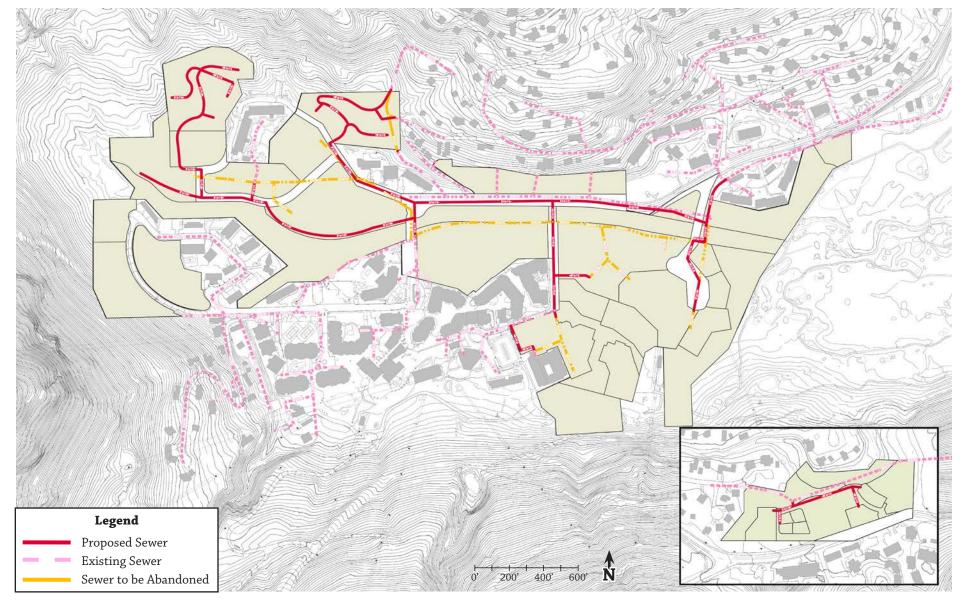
CONCEPTUAL UTILITIES PLAN - WASTEWATER
